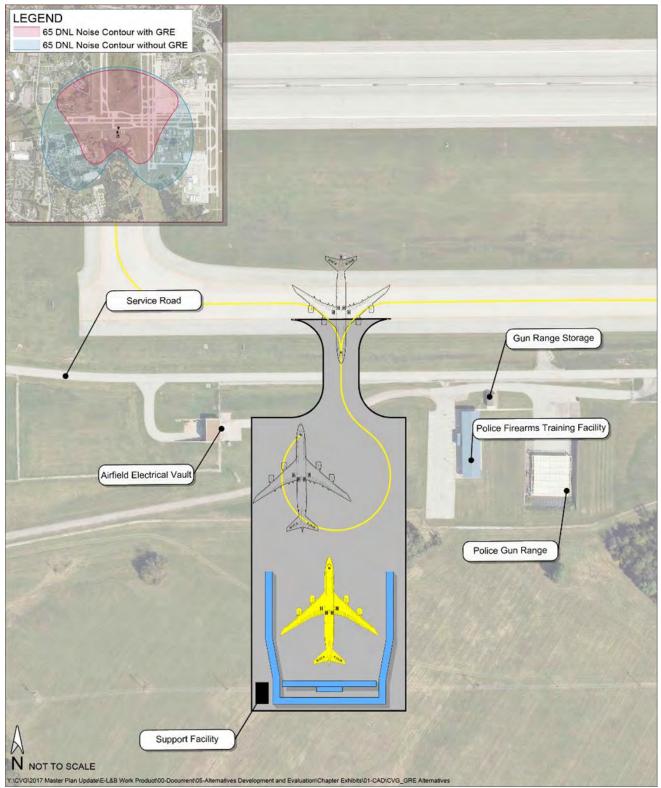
ALTERNATIVE SITE 1 – NO GRE
